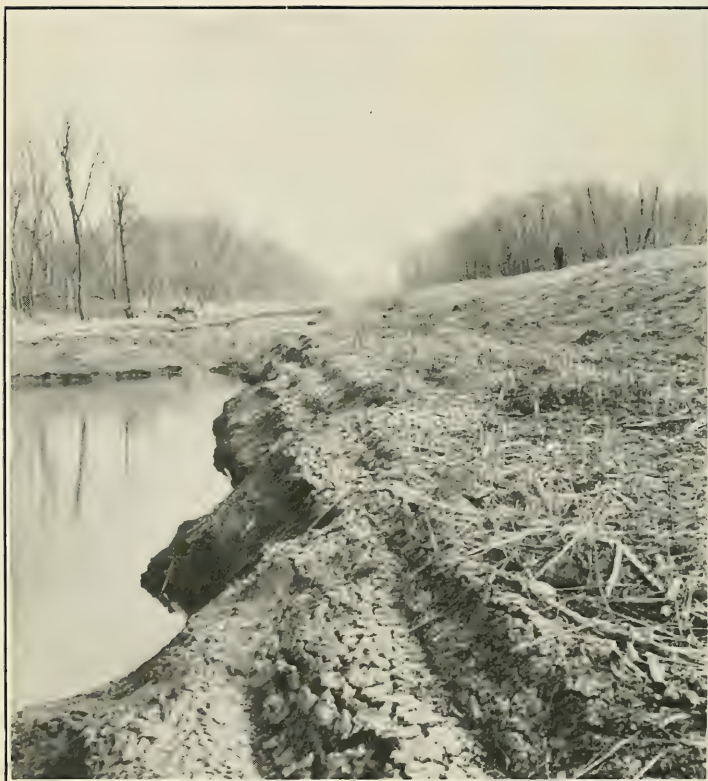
FINISHED HYDRAULIC FILL SAND LEVEE.
